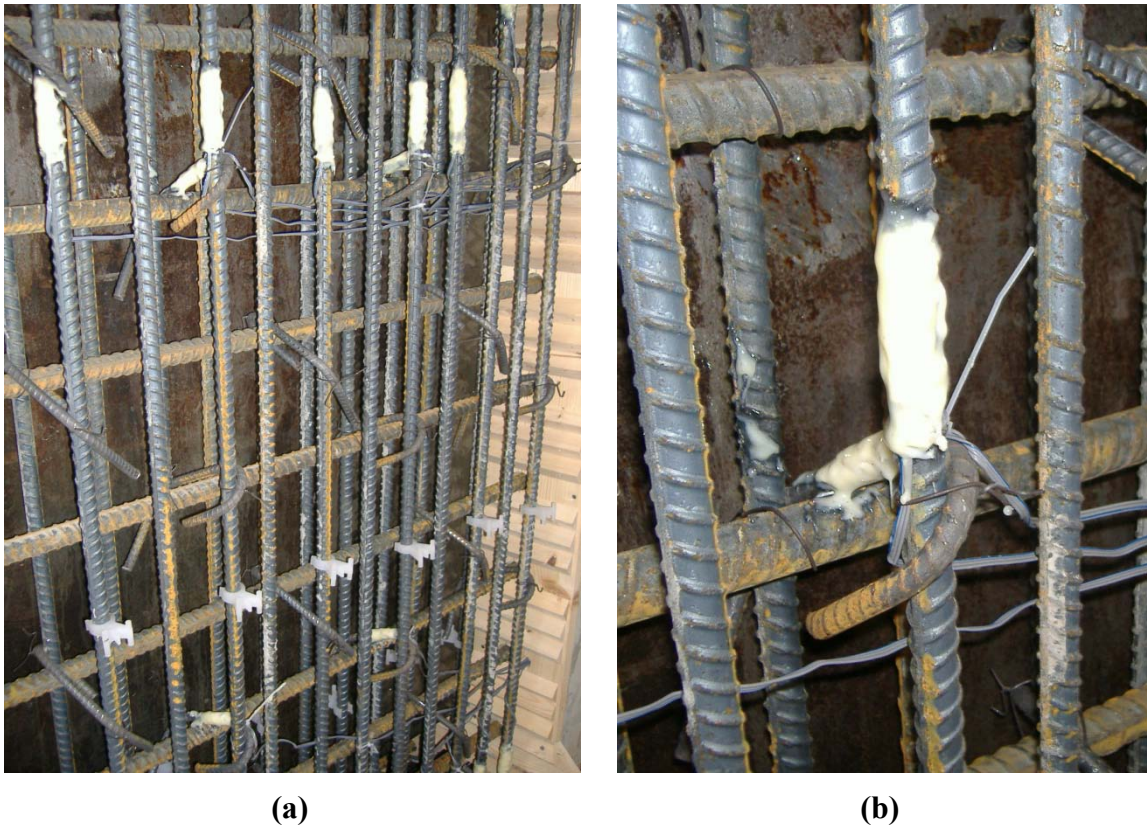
Girder No.7 (G94C): (a) web reinforcement cage showing the location of strain gages at the vertical rebar and No.3 web tie bars, and (b) close-up of a typical No.3 tie bar.
